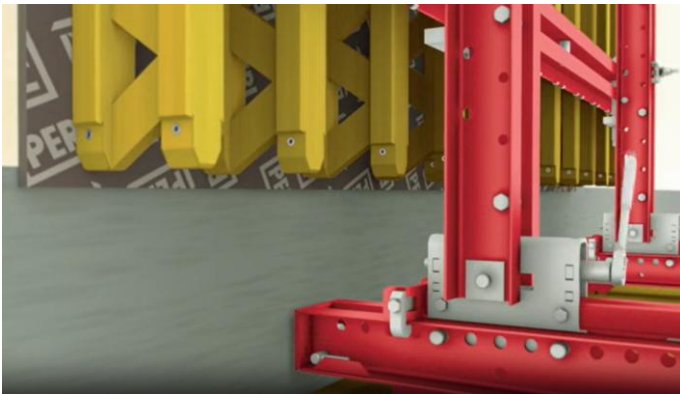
The Adjusting Unit SCS is used to position the wall formwork. The base of the formwork is pressed tightly against the previous concreting section. This method proved to be highly effective in preventing concrete leakage in complex-shaped structures
